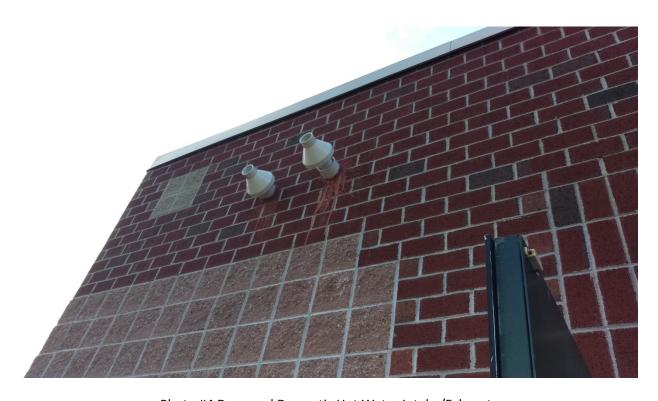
Damaged Domestic Hot Water Intake/Exhaust
